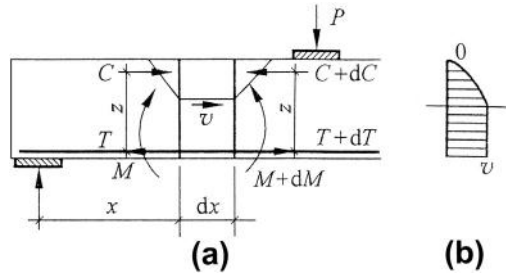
Beam model: (a) calculation model, (b) distribution of shear stress on section
